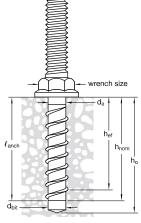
KWIK HUS-EZ E anchor installation details
